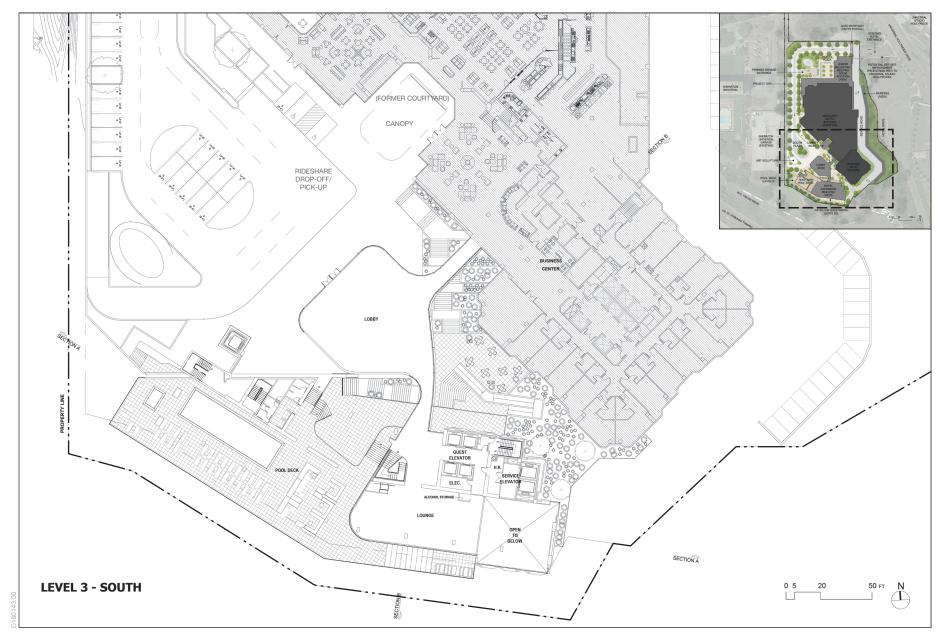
Level 3 (South) – Hotel Expansion Building
